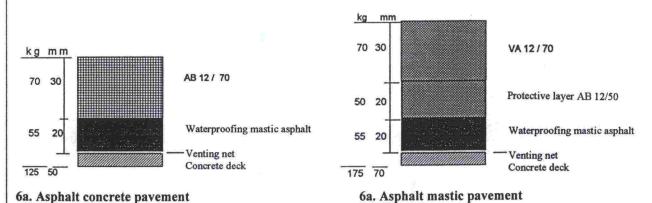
Pedestrian and biovale bridge with concrete deck Surfa
